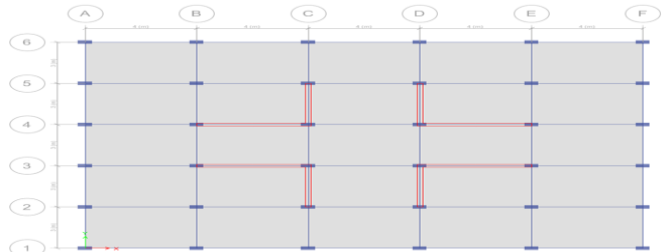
Plan of (G+15) storied building with infill wall and shear wall/steel bracing in open ground storey.
